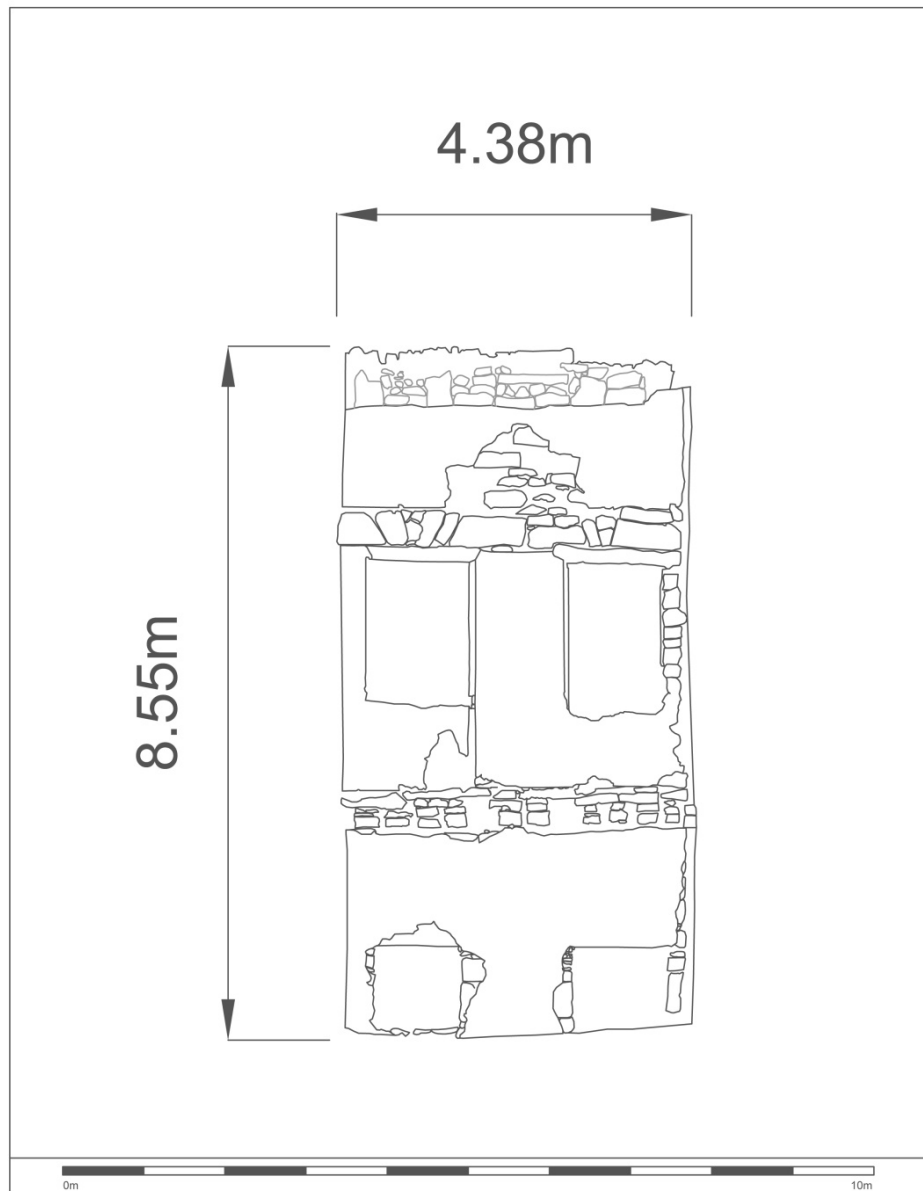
Internal elevation of the north-west wall of the signal tower at Inishmore Signal Station.
